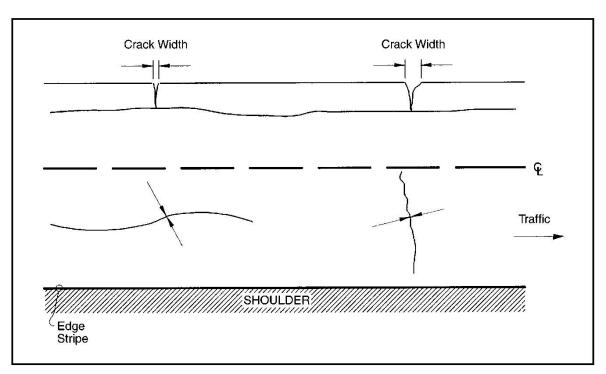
Measuring Crack Width on Asphalt Pavement
